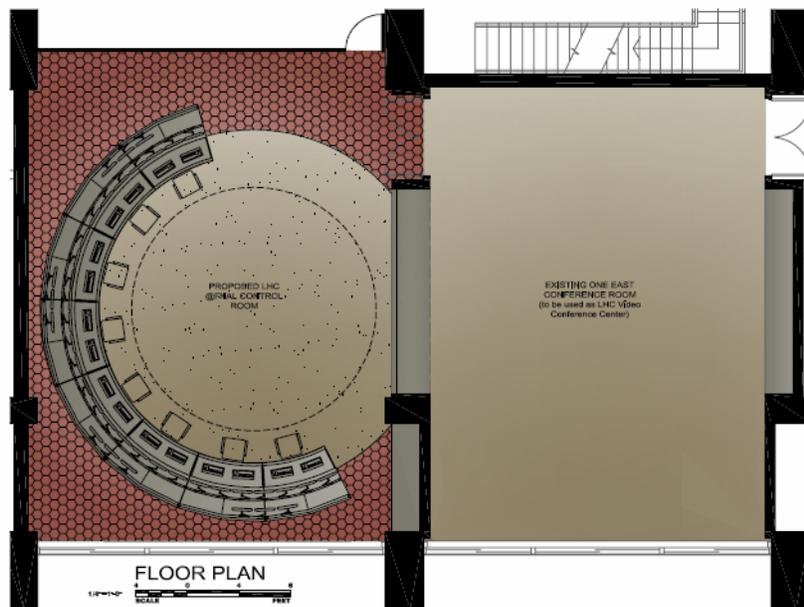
Floor Plan of proposed Fermilab LHC and CMS remote access center.
